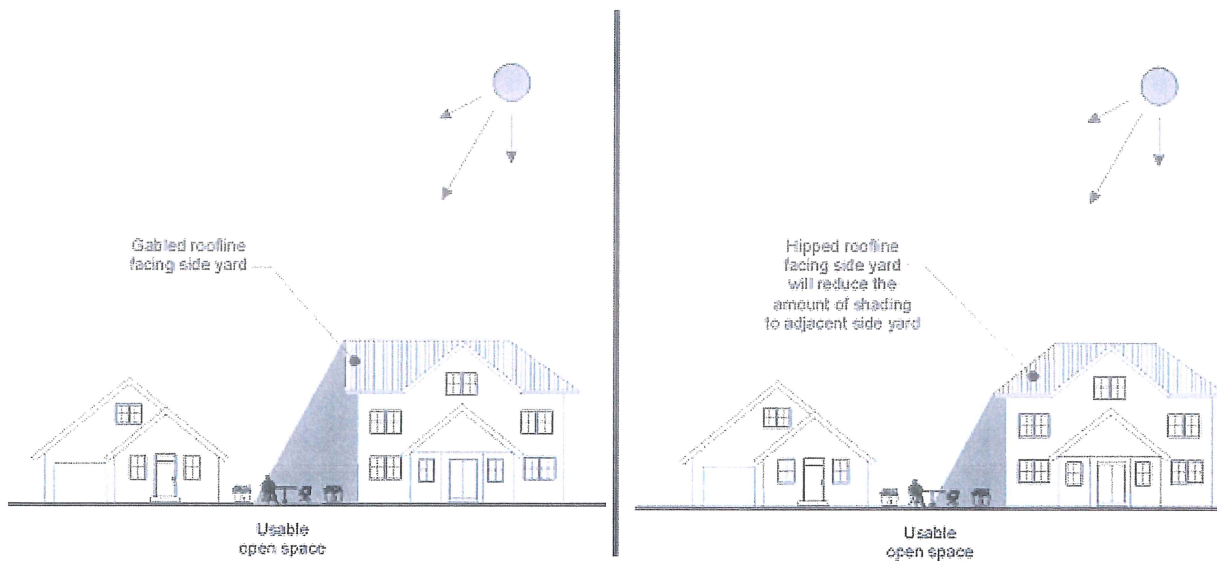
Encourage rooflines along the side yard that maximize solar access to adjacent homes and/or private open space.
